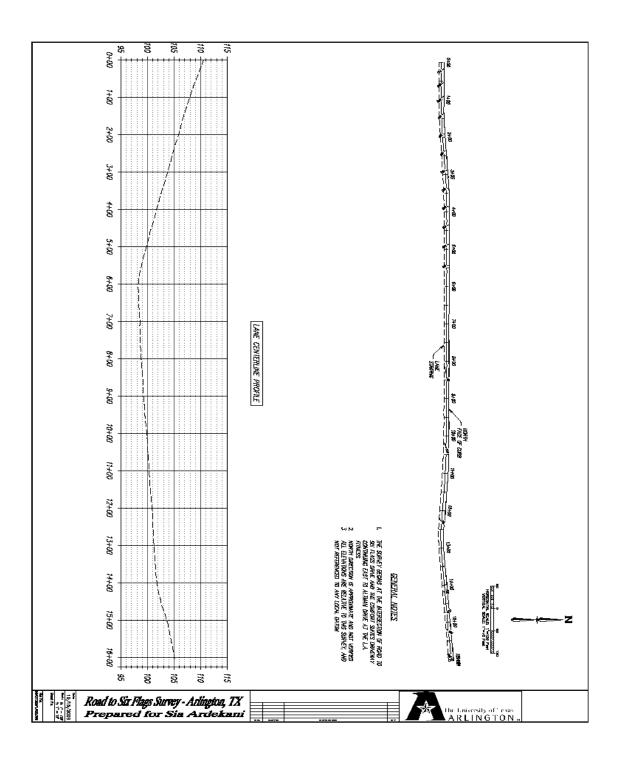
Longitudinal Grade for Road to Six Flags Street (PCC) in Arlington, TX.
